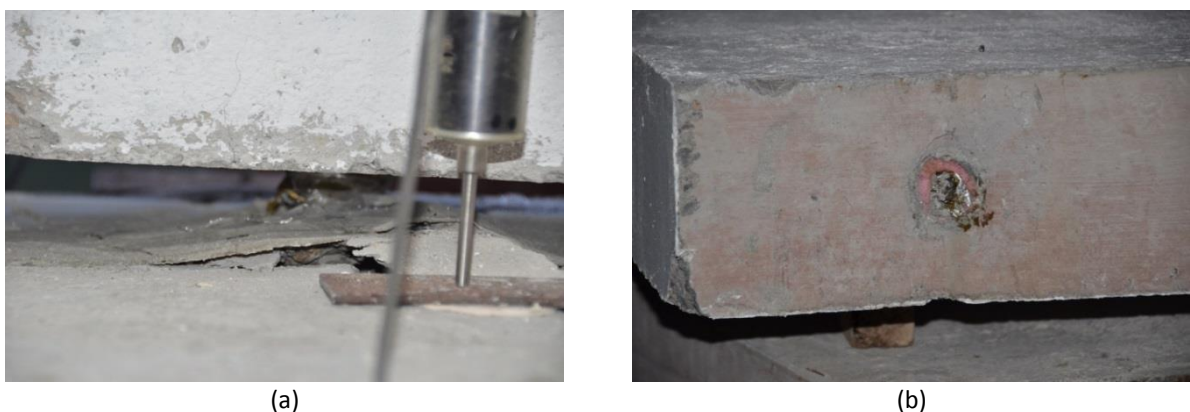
Test A1D25M-G: Damage observed on the tension side at the end of the initial monotonic loading: (a) severe damage to the beam around the rebar; (b) broken rebar but no visible damage to the panel.
